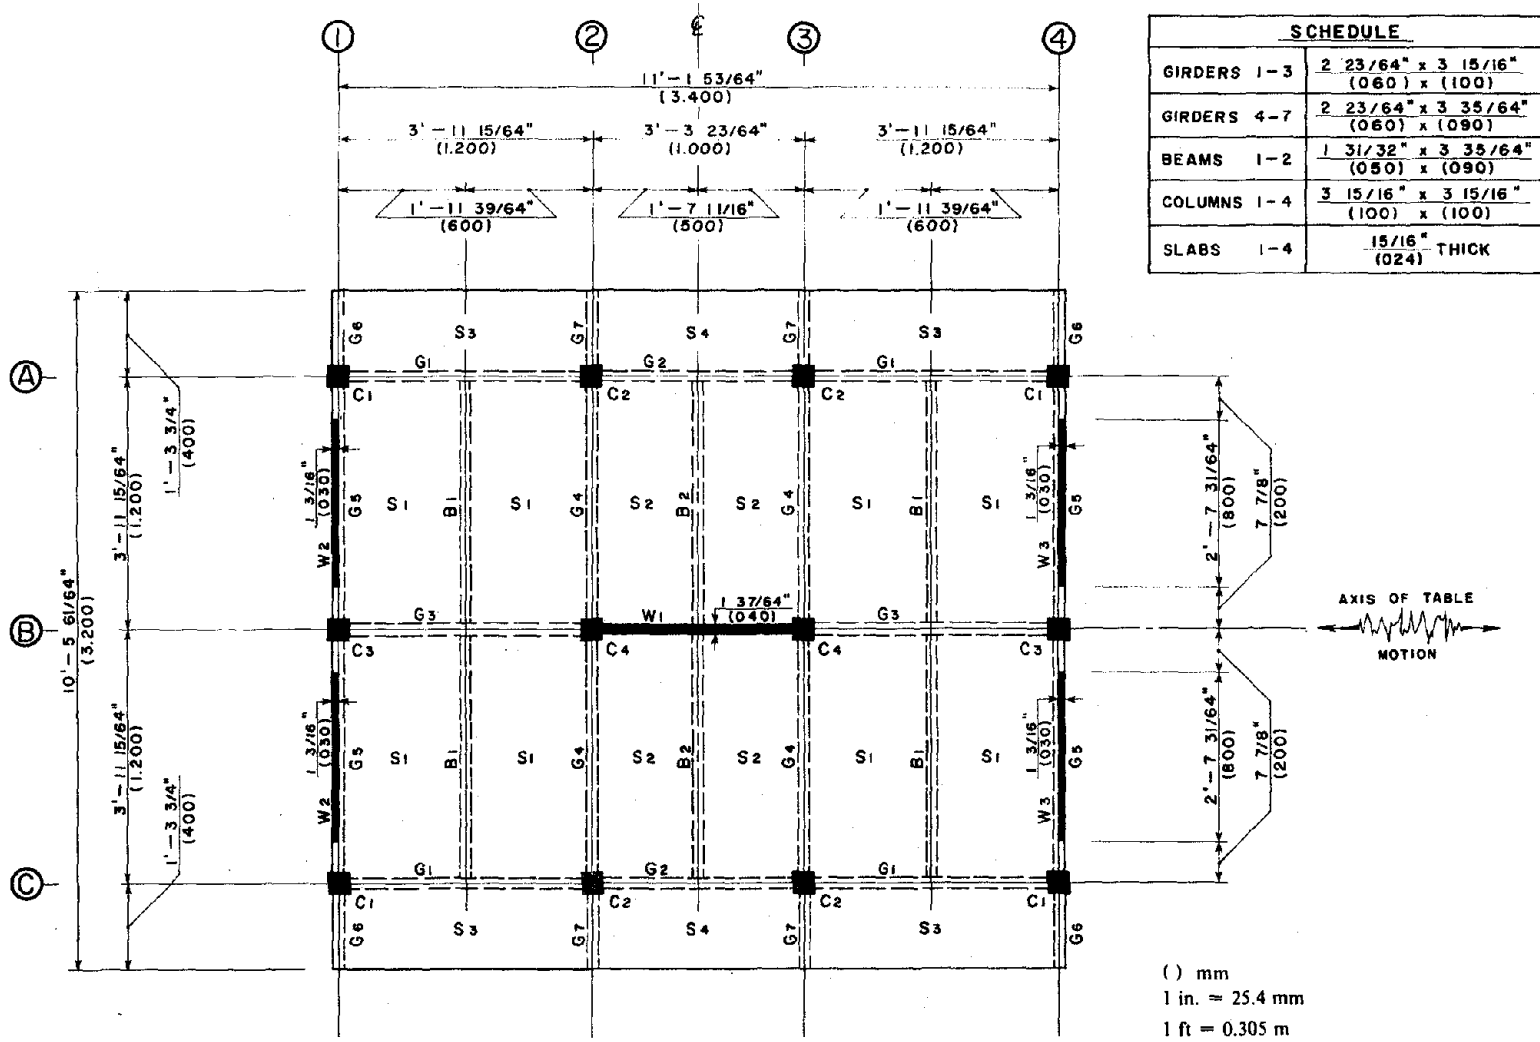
TYPICAL FLOOR PLAN OF THE 1/5-SCALE MODEL.
